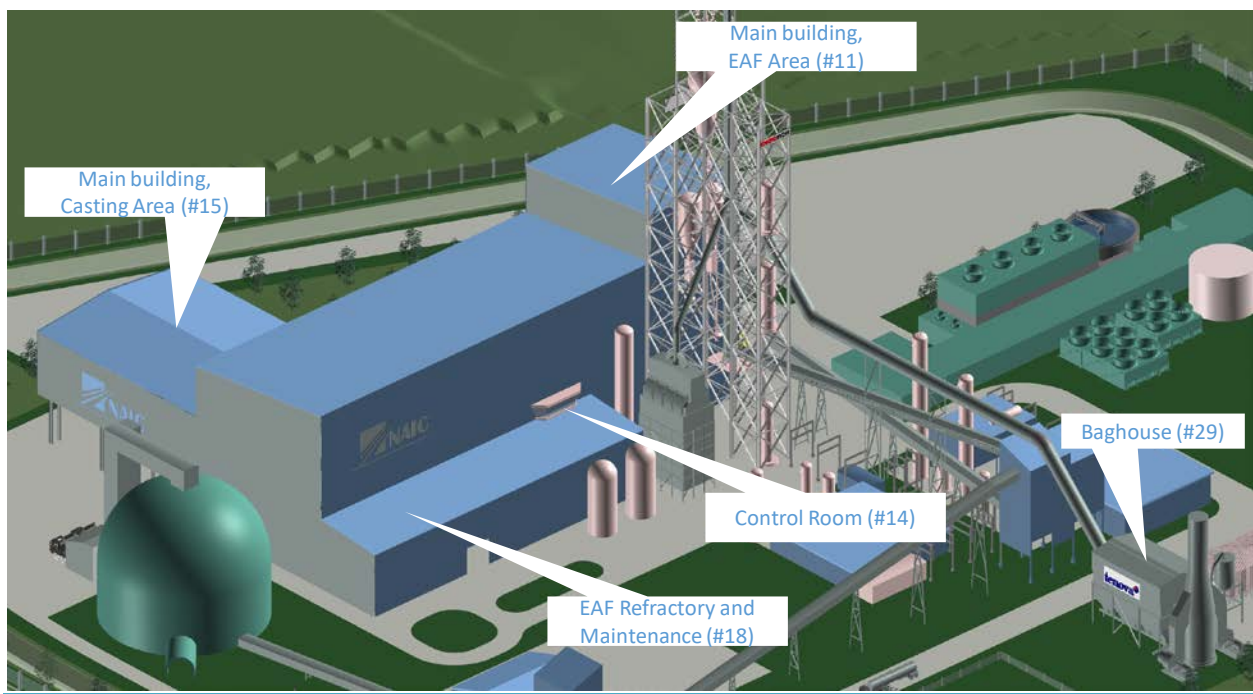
3D view of the melting and casting building and relevant services
